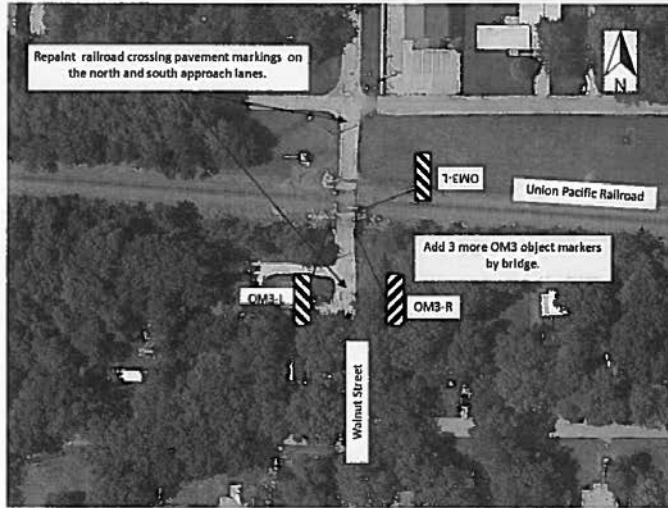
Low-cost recommendations at UP Railroad & Walnut Street crossing
